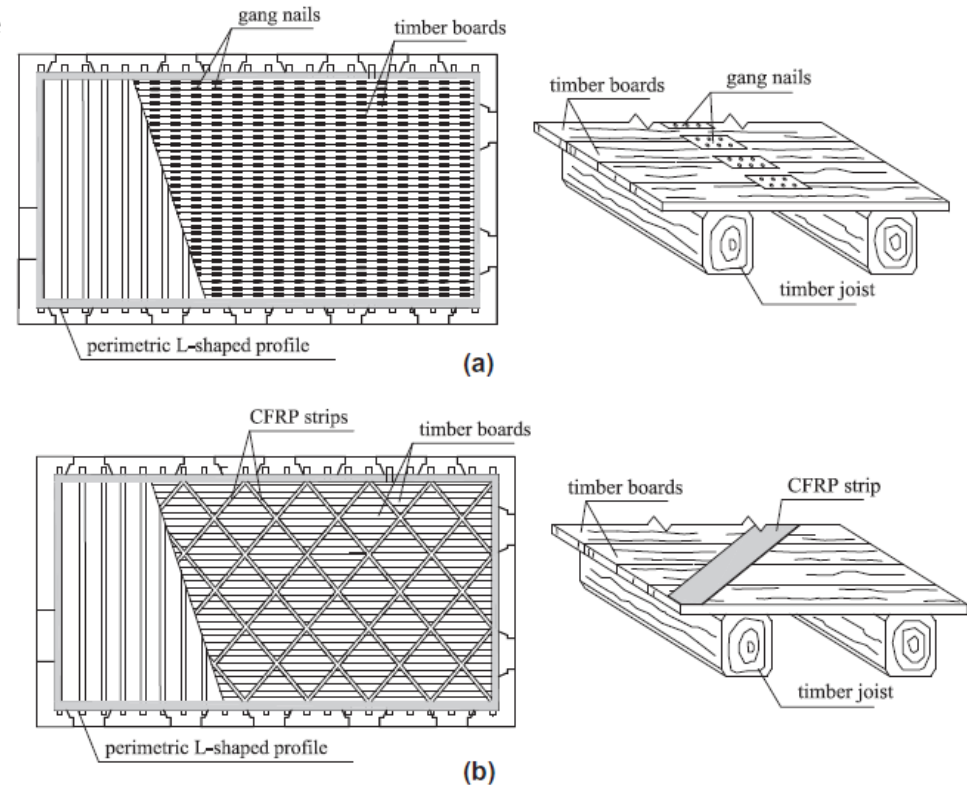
Wooden floor stiffened using nail plates (a) and CFRP strips (b).
